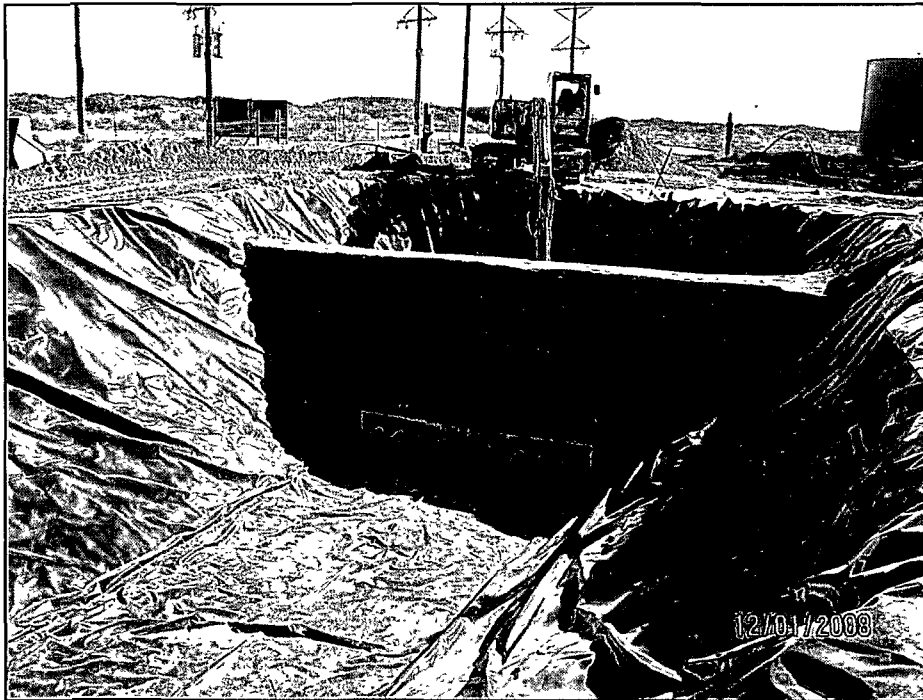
View of the completed divider wall to allow washing and the collection of rinsate.
